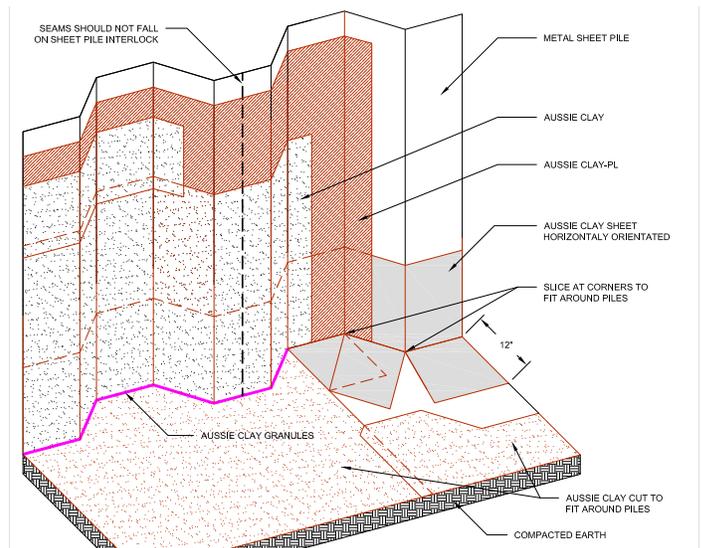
SHEET METAL PILING TRANSITION IN A SHOTCRETE HYDROSTATIC CONDITION
